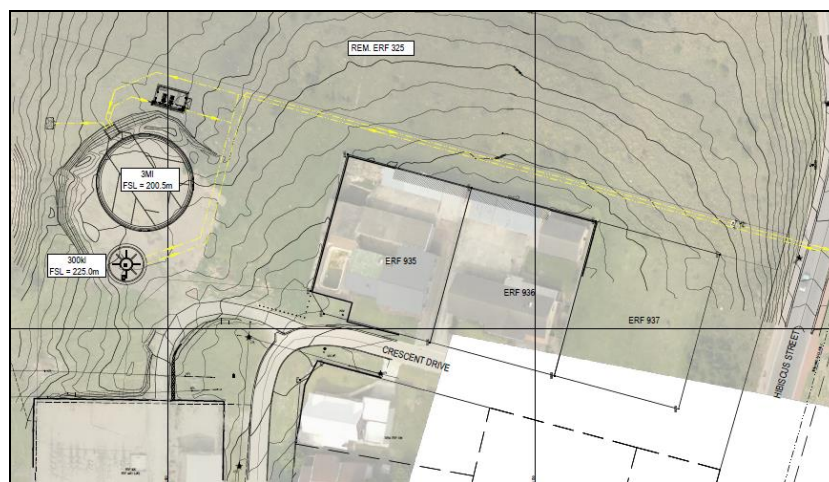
An extract of the Site Plan indicating the proposed infrastructure.
